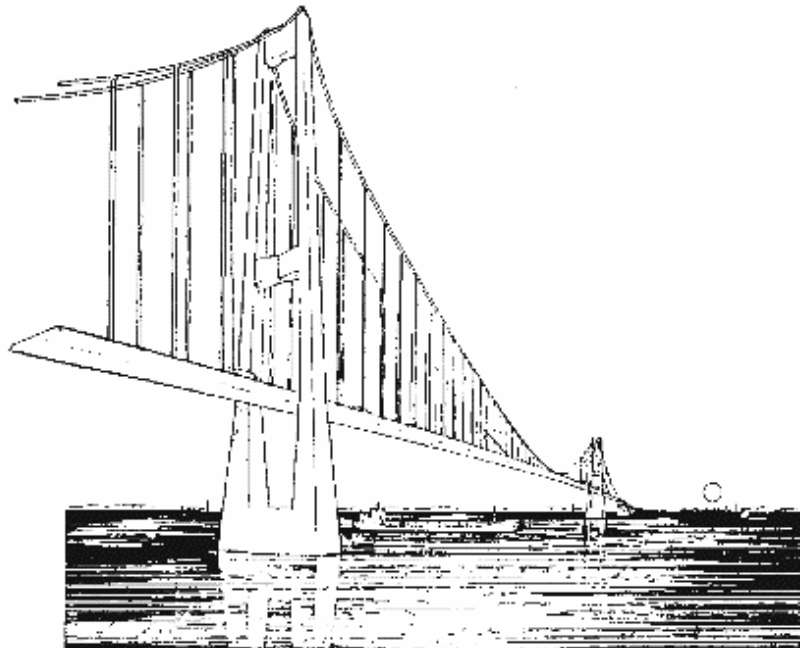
East bridge: perspective view of 1700 m record main span suspension bridge.
